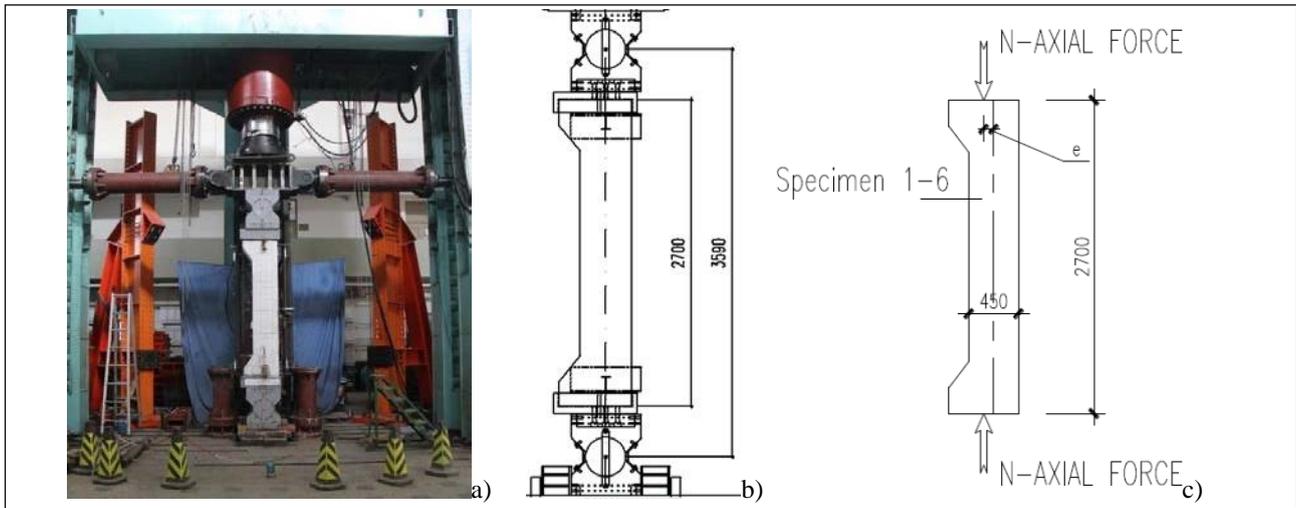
Phase 1:Test setup:a)staticsetupinlaboratoryb)boundaryconditions;c)loadapplication.”
